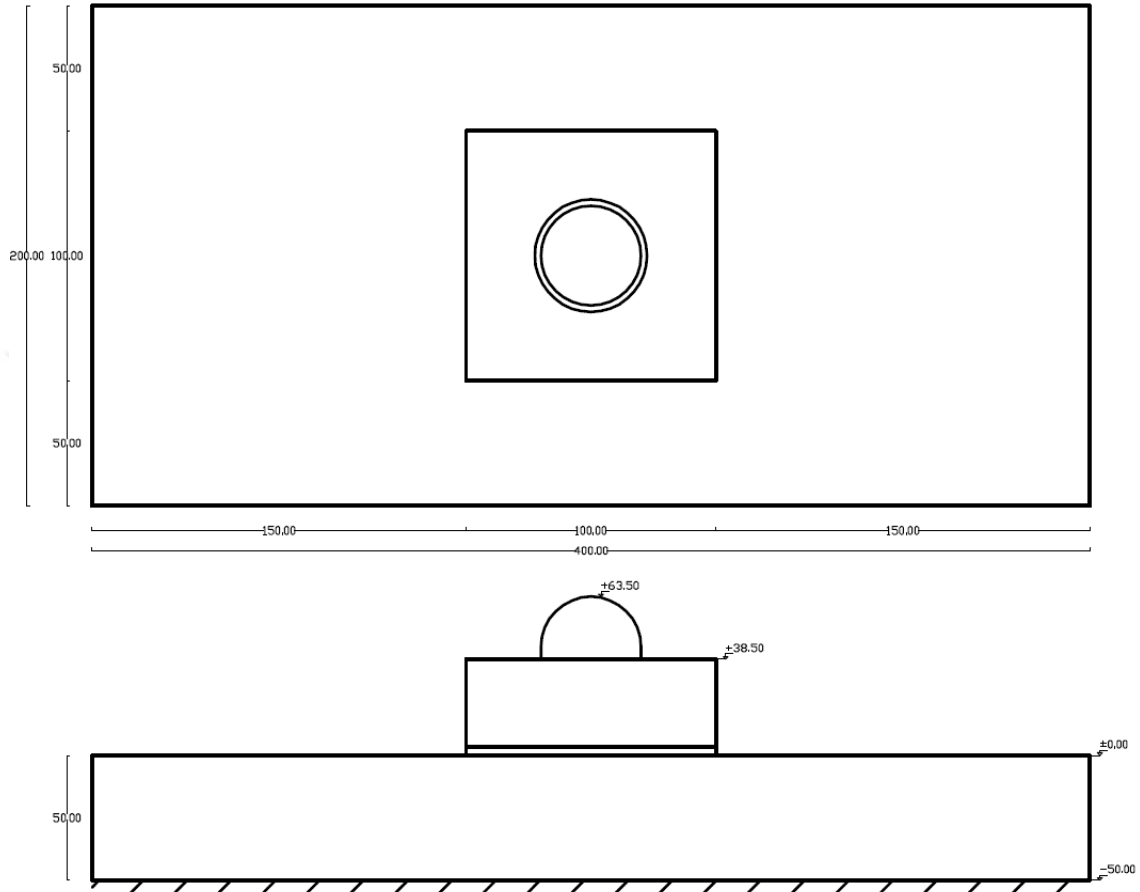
Plan of the soil (on the top) and longitudinal view (on the bottom).
